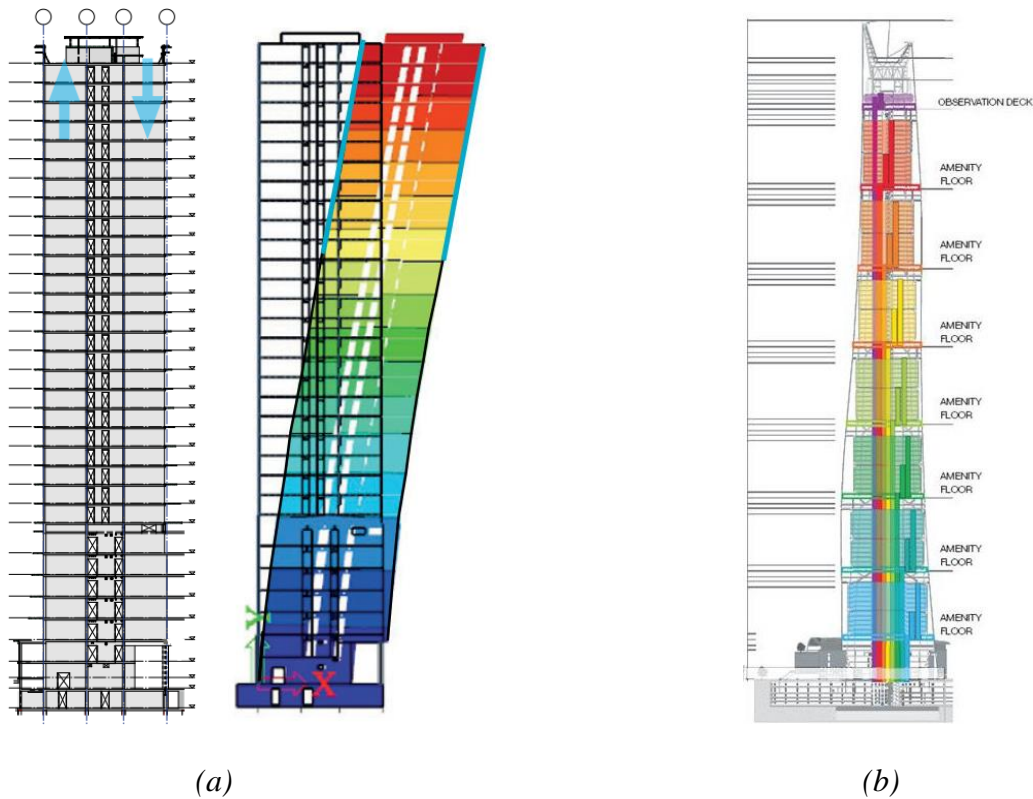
(a): Stiff installation room serving as outrigger in Amstel tower. Source: Andjelic et al. [8]; (b): Overview of installation zones corresponding with outrigger locations Shanghai tower. Source: Risen [96].
